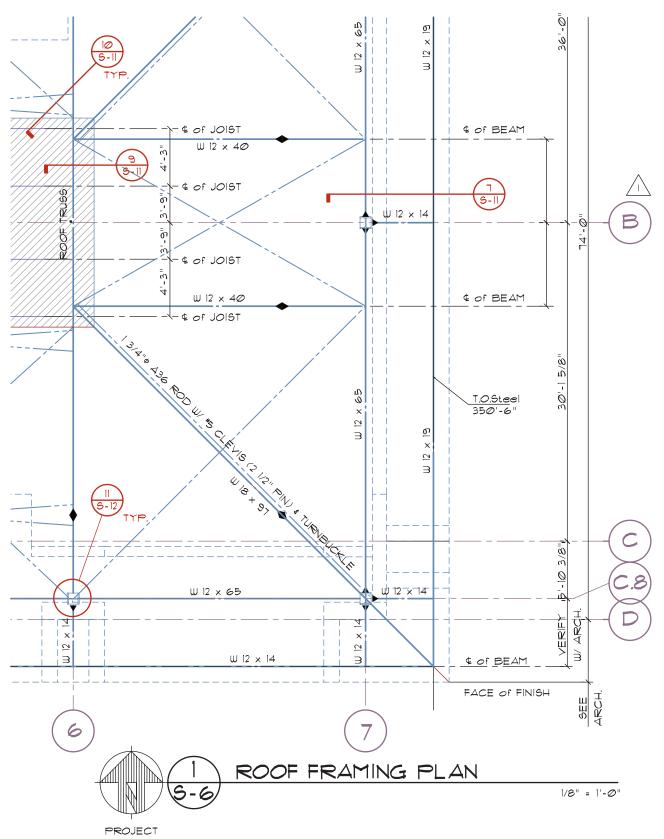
The structural drawings show how to construct the skeleton of a structure. Courtesy VLMK Consulting Engineers
